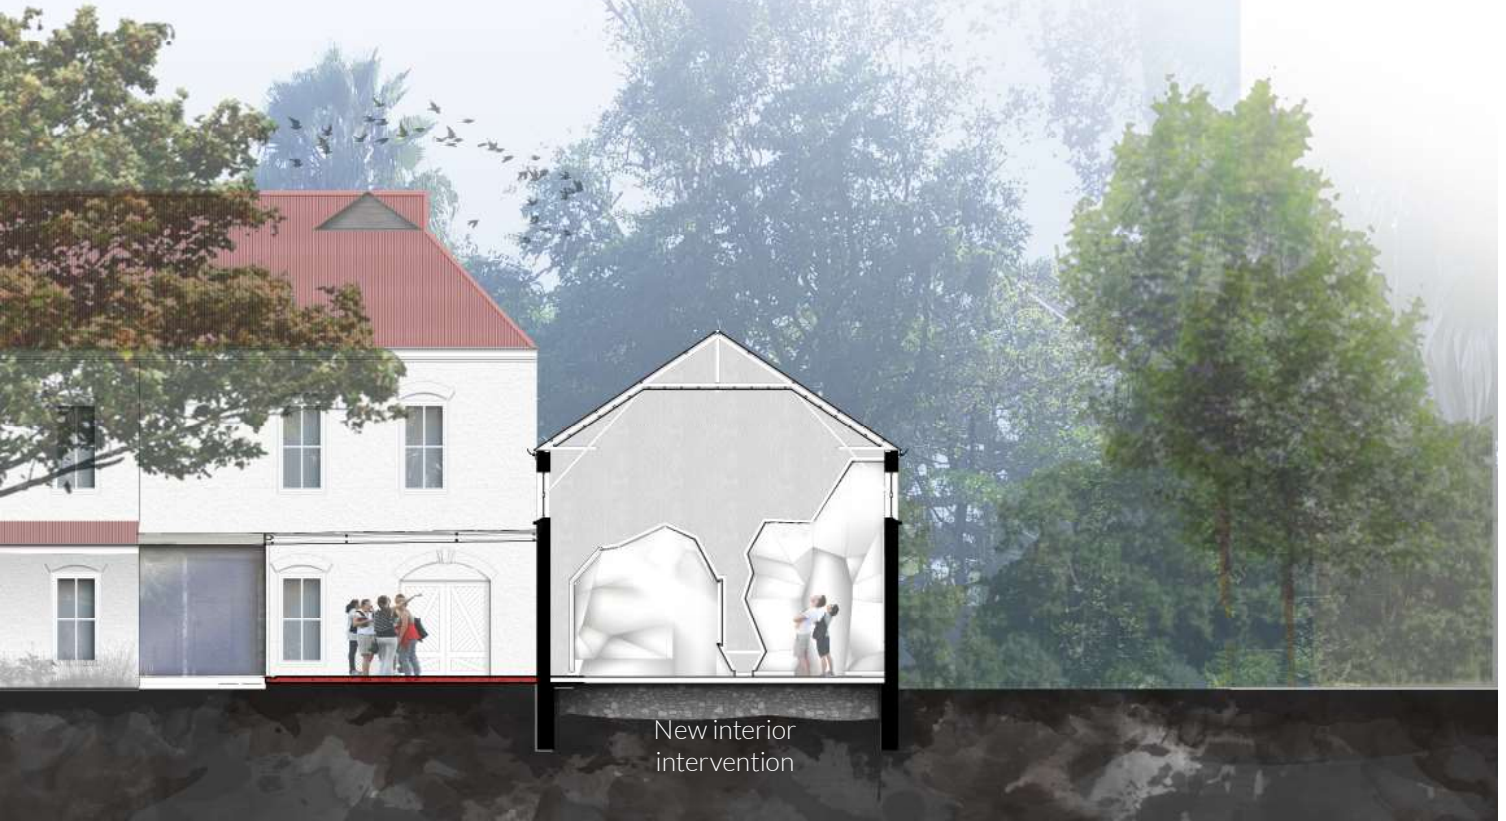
East west section indicating new intervention as well as restored wing NTS
